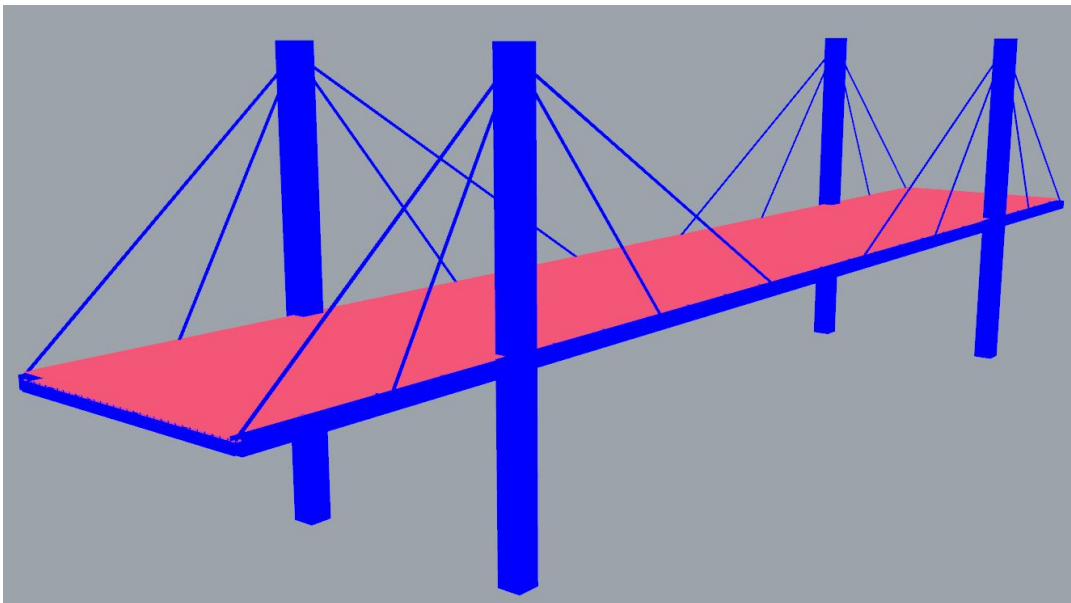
Structural model of the double pylon cable stayed bridge with all element properties as modelled in Karamba
